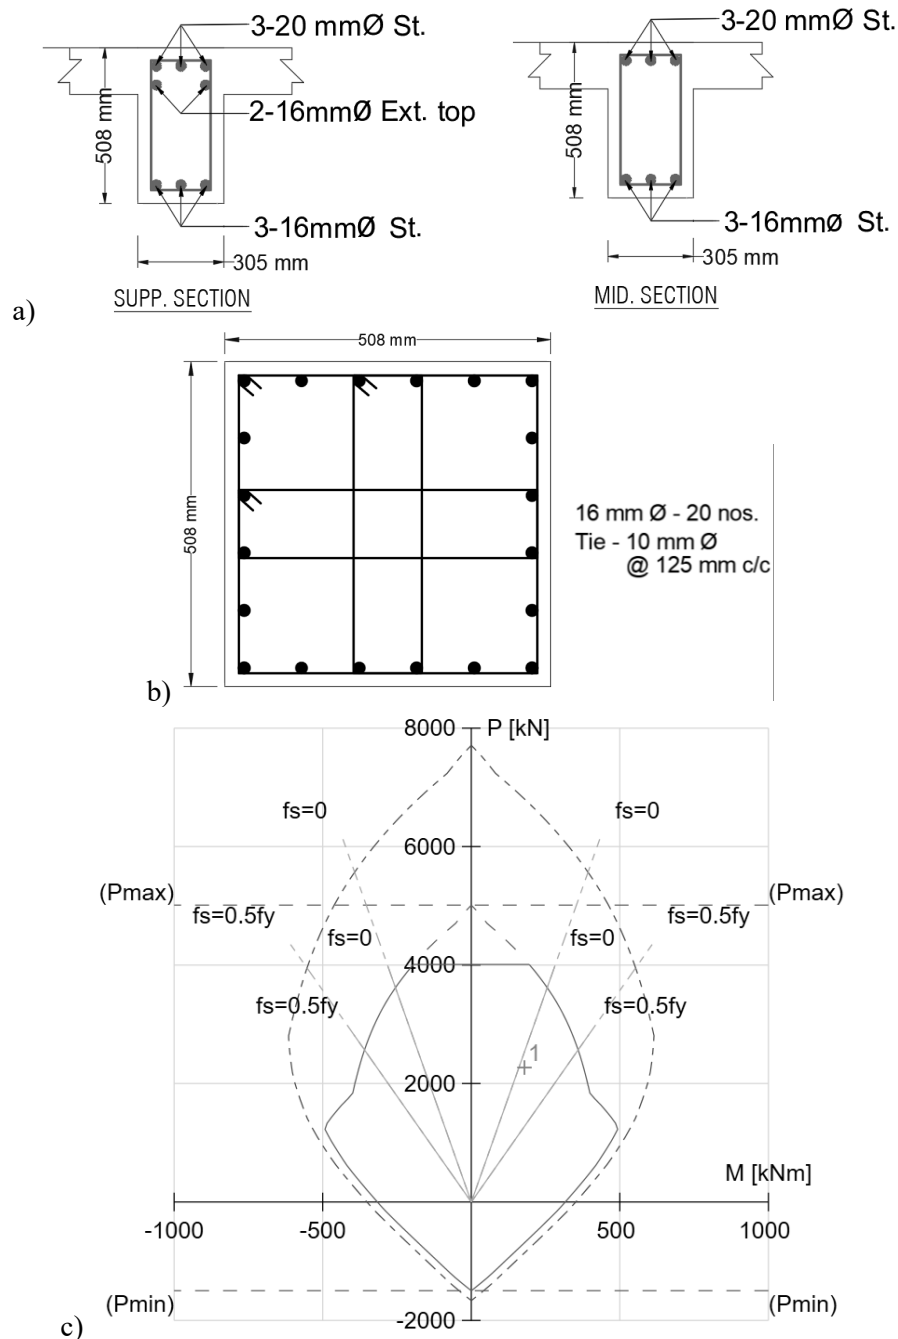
Beam and column details designed with FBSD– a) beam, b) column, c) column capacity
